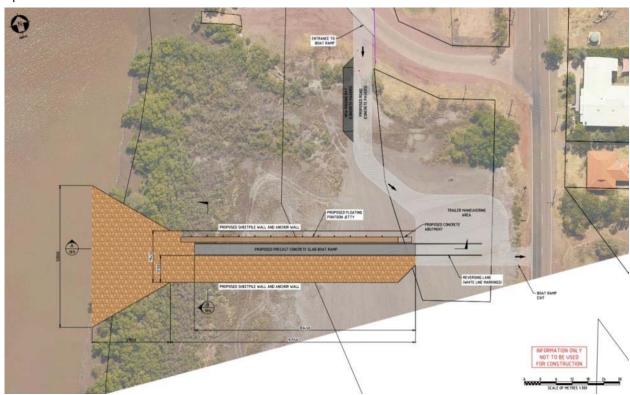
Plan - Alternative Location - Sheet Pile Wall Option
